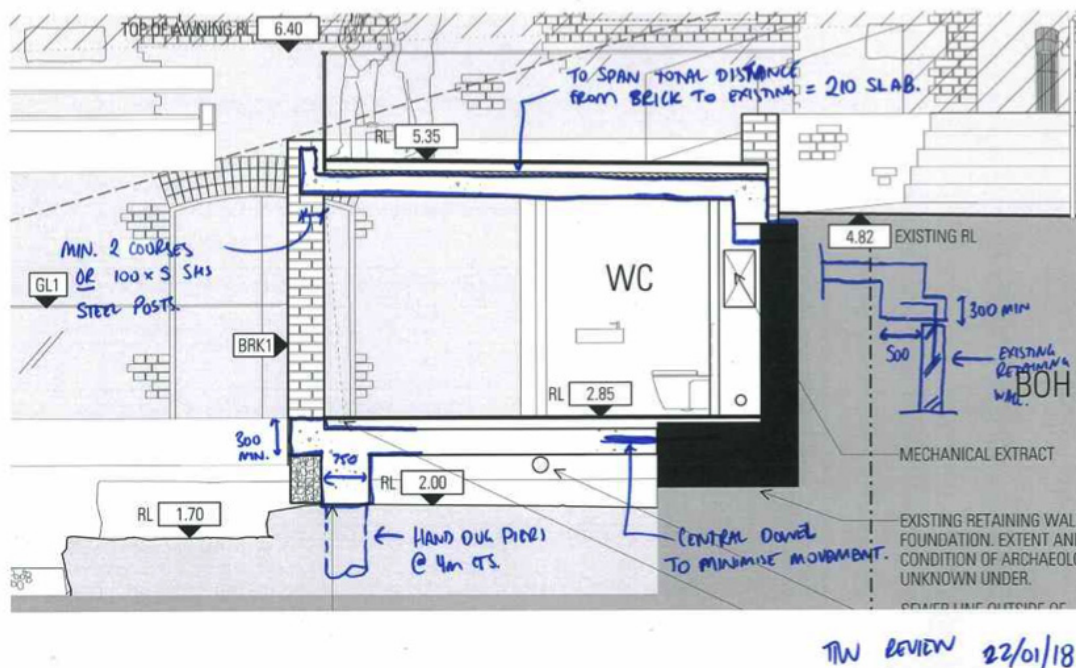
South section showing construction details for piers below toilets and concrete floor and edge beam above archaeological remains. (Source: TTW 180122_bay12sections)
